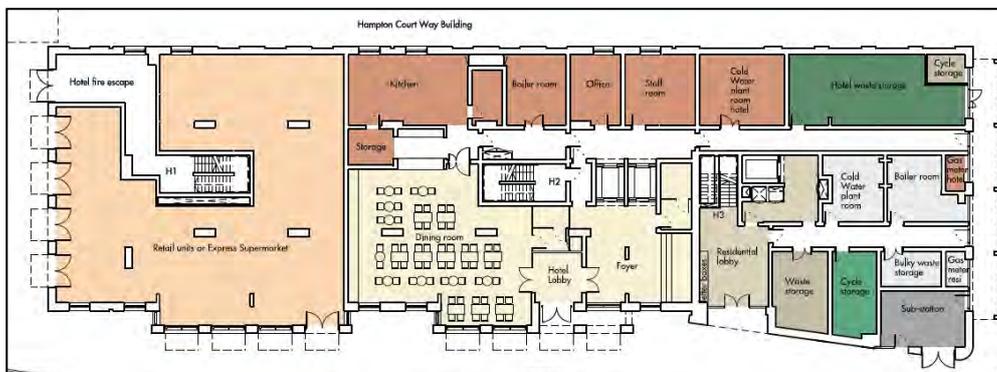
Proposed ground floor layout for the Hampton Court Way Building
